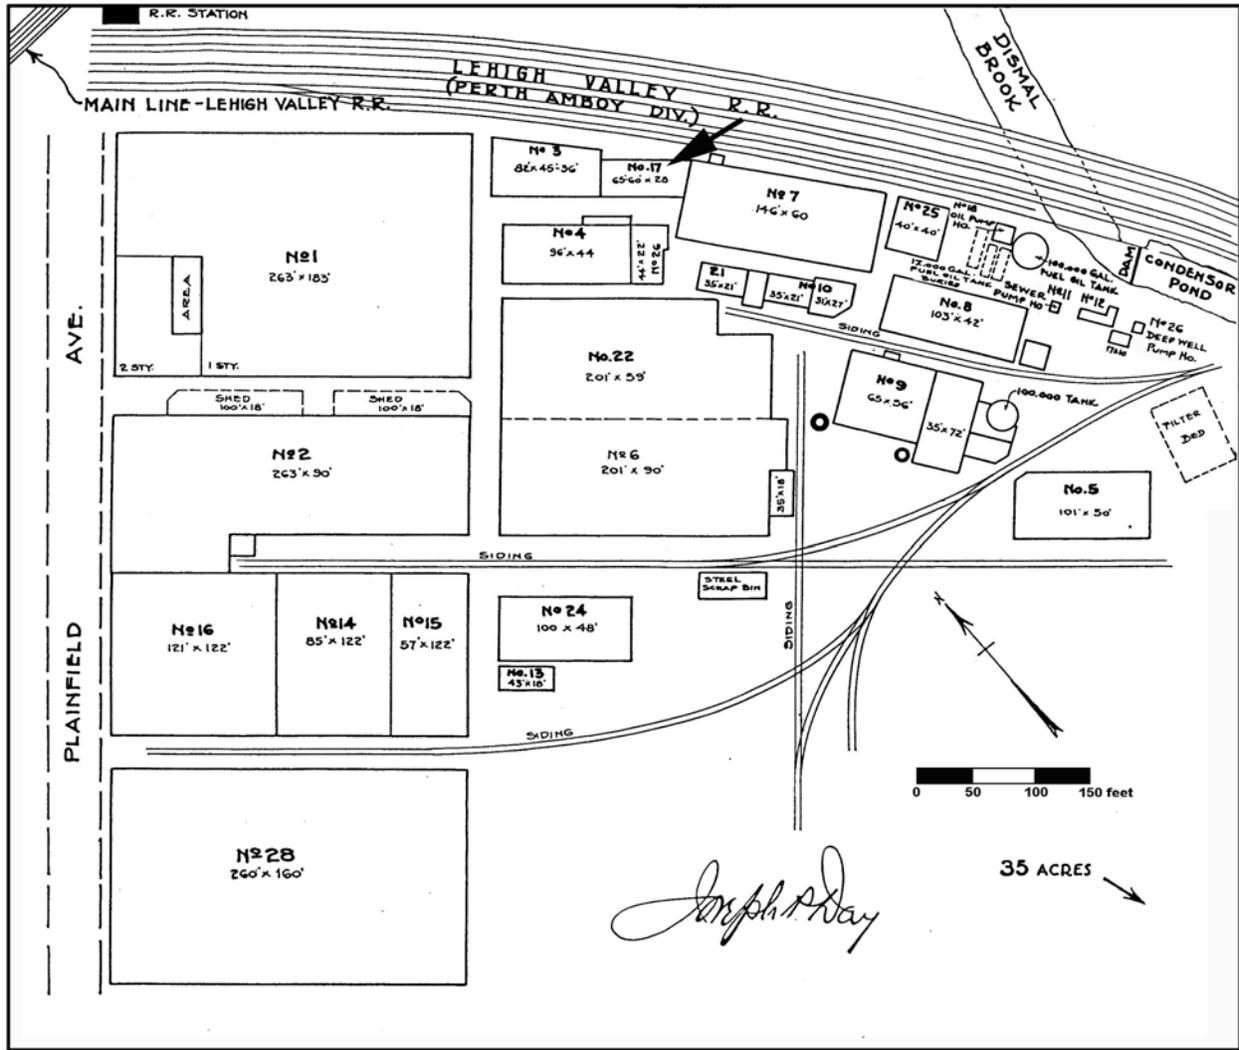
BUILDING 17 AND 1929 SOUTH PLAINFIELD WORKS
